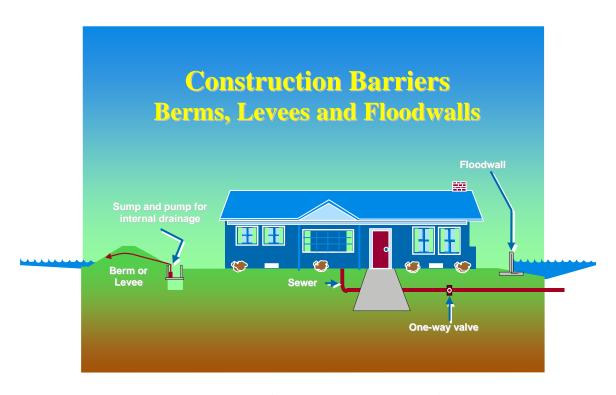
Example of how berms, levees and floodwalls can be used to protect a structure
